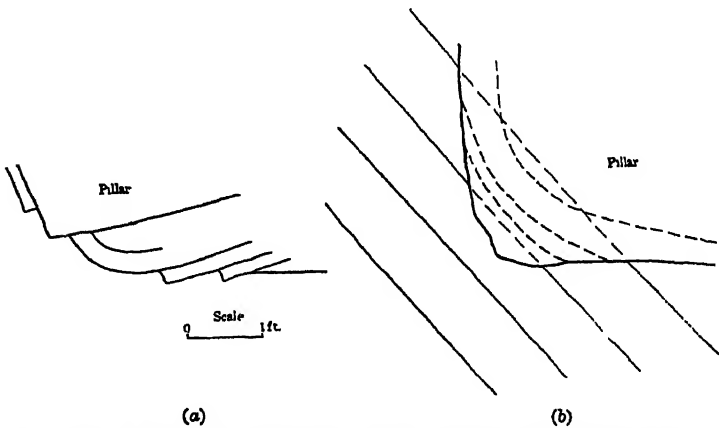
(a) PLAN OF CORNER OF PILLAR SHOWING ROUNDING OF CORNER. (b) PLAN OF CORNER OF PILLAR SHOWING LACK OF EFFECT OF SLIP PLANES ON FAILURE OF PILLARS.
